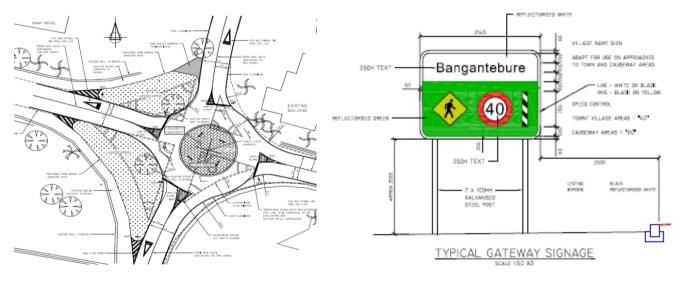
Bairiki roundabout and gateway signage detail (Roughton International, 2011b)
